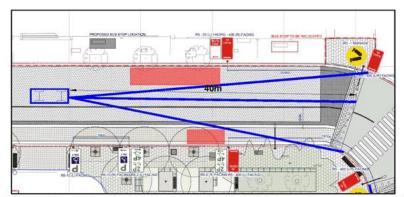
A diagram demonstrating the Approaching Sight Distance for eastbound traffic in Phillip Street as per section 3.2.1 of Austroads Guide to Road Design (2017) Part 4A
